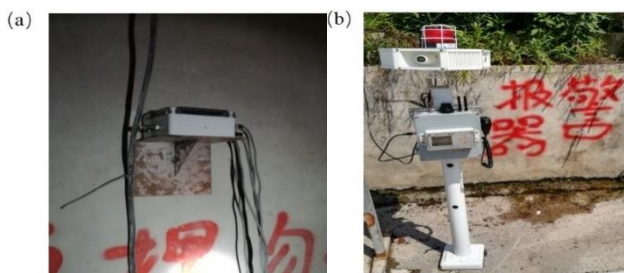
On-site installed instruments. (a) The MA installation position in the tunnel; and (b) The RCBS installation position outside the tunnel
